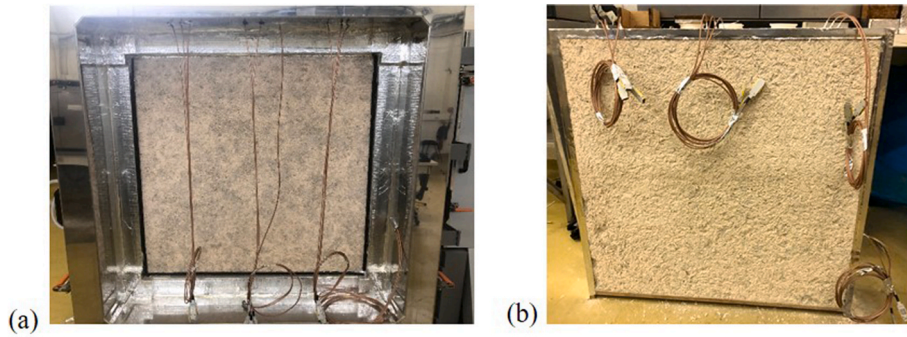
$90 \times 90 \times 10 \text{ cm}^3$  insulating walls: Reference hemp concrete (a) and PCM hemp concrete (b).
